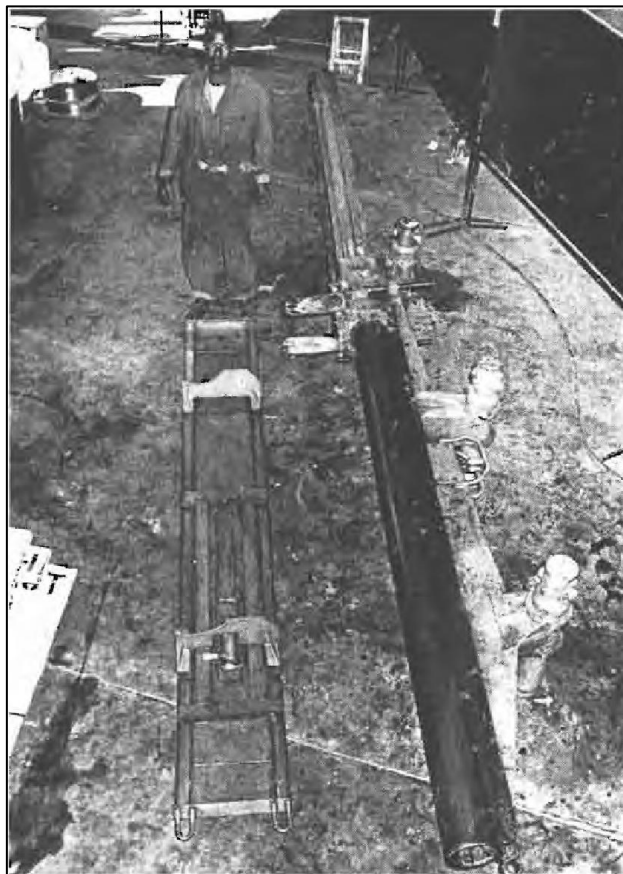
Prototype rock-cutting machine developed by COMRO (Cook, et al., 1968a)
